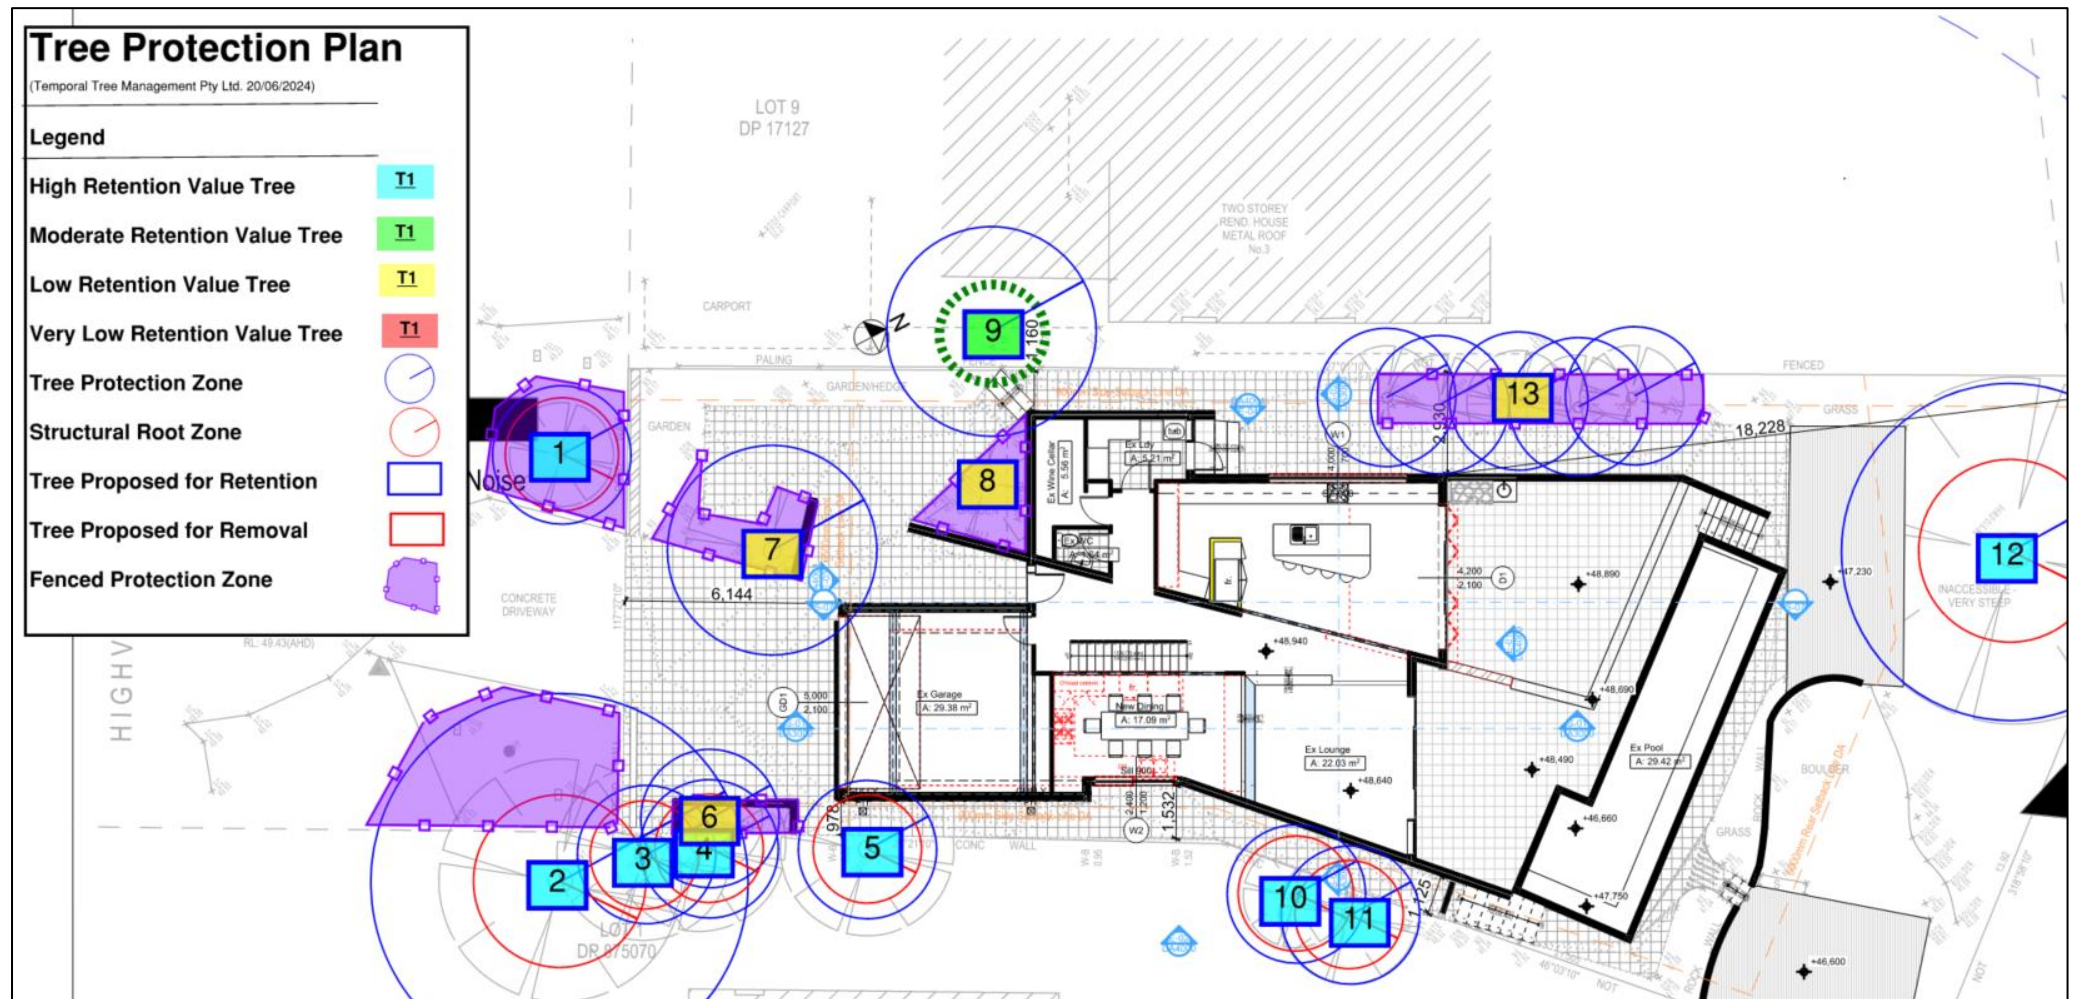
Tree Protection / Removal Plan for proposed development. Site Plan prepared by *Rapid Plans* (Project Number: RP0523NES, Drawing No: DA1002, Issue: -, drawn 15/04/2024).
